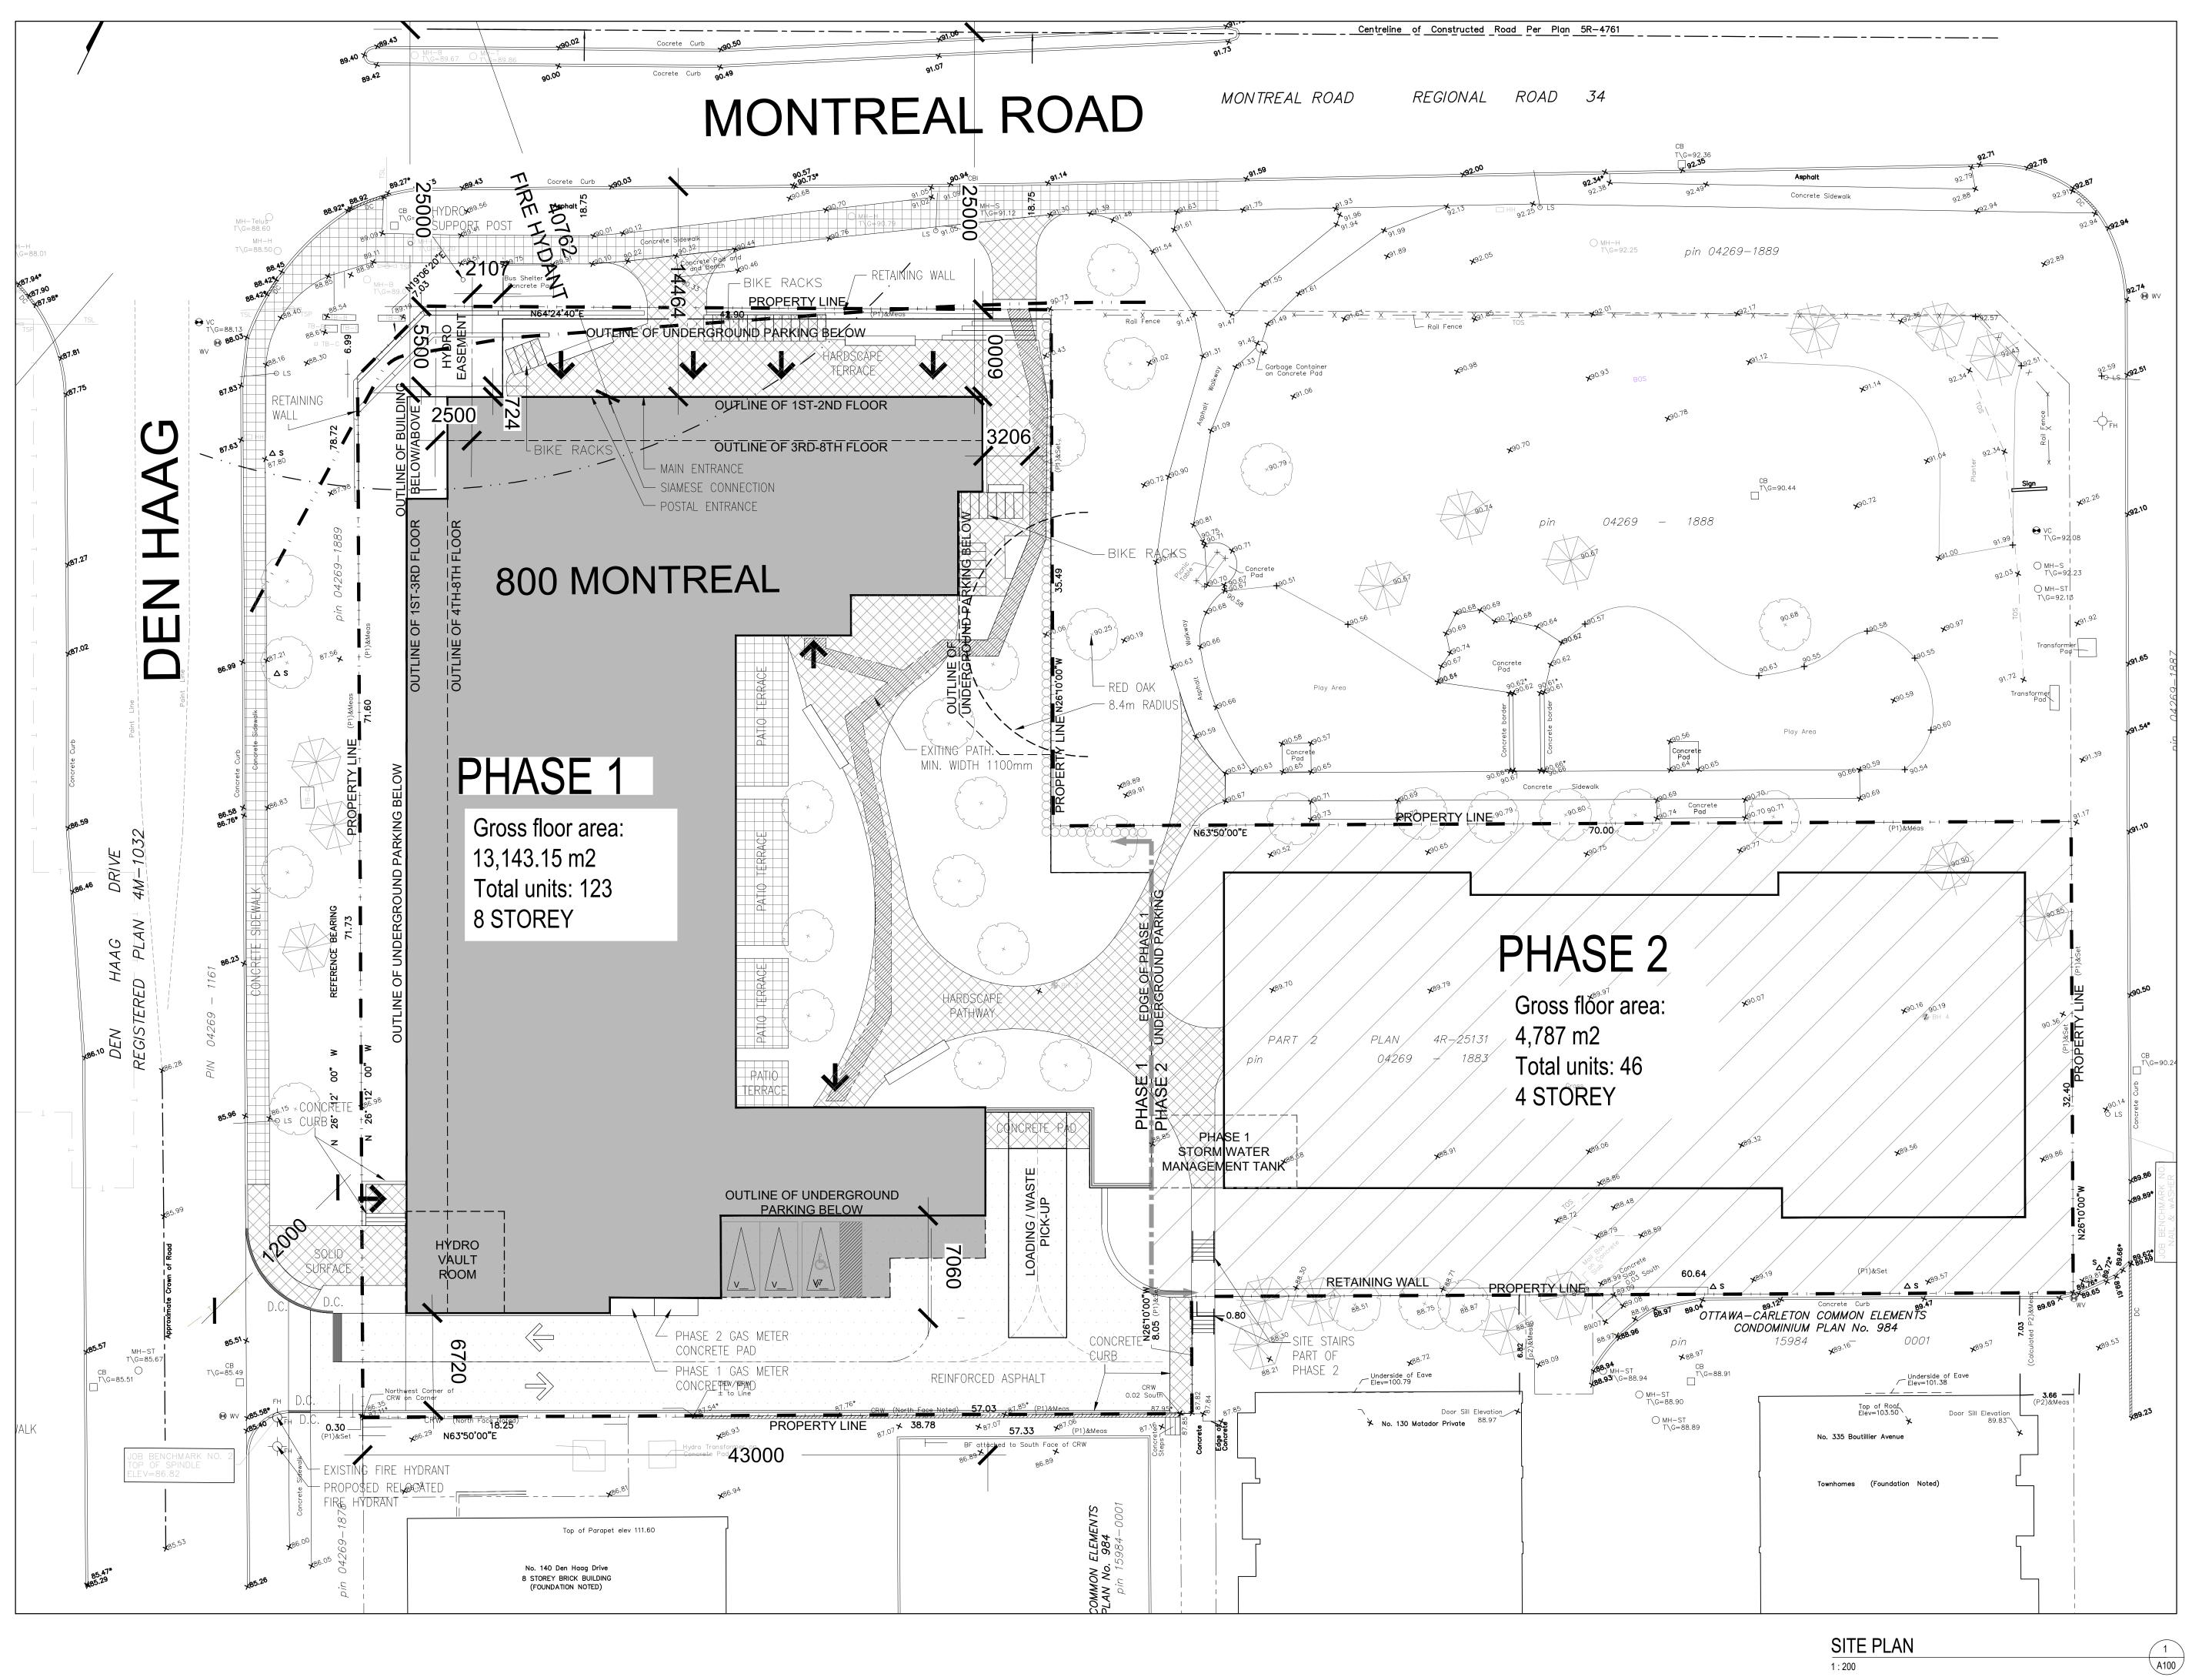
Location Map Site Plan by Neuf Architects AOV Plan of Survey City of Ottawa Preconsult meeting notes
